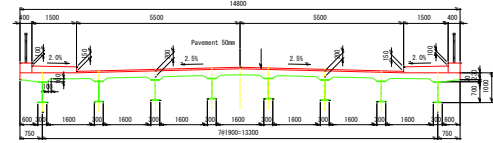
Typical Cross Section of Each Bridge (2/2)
